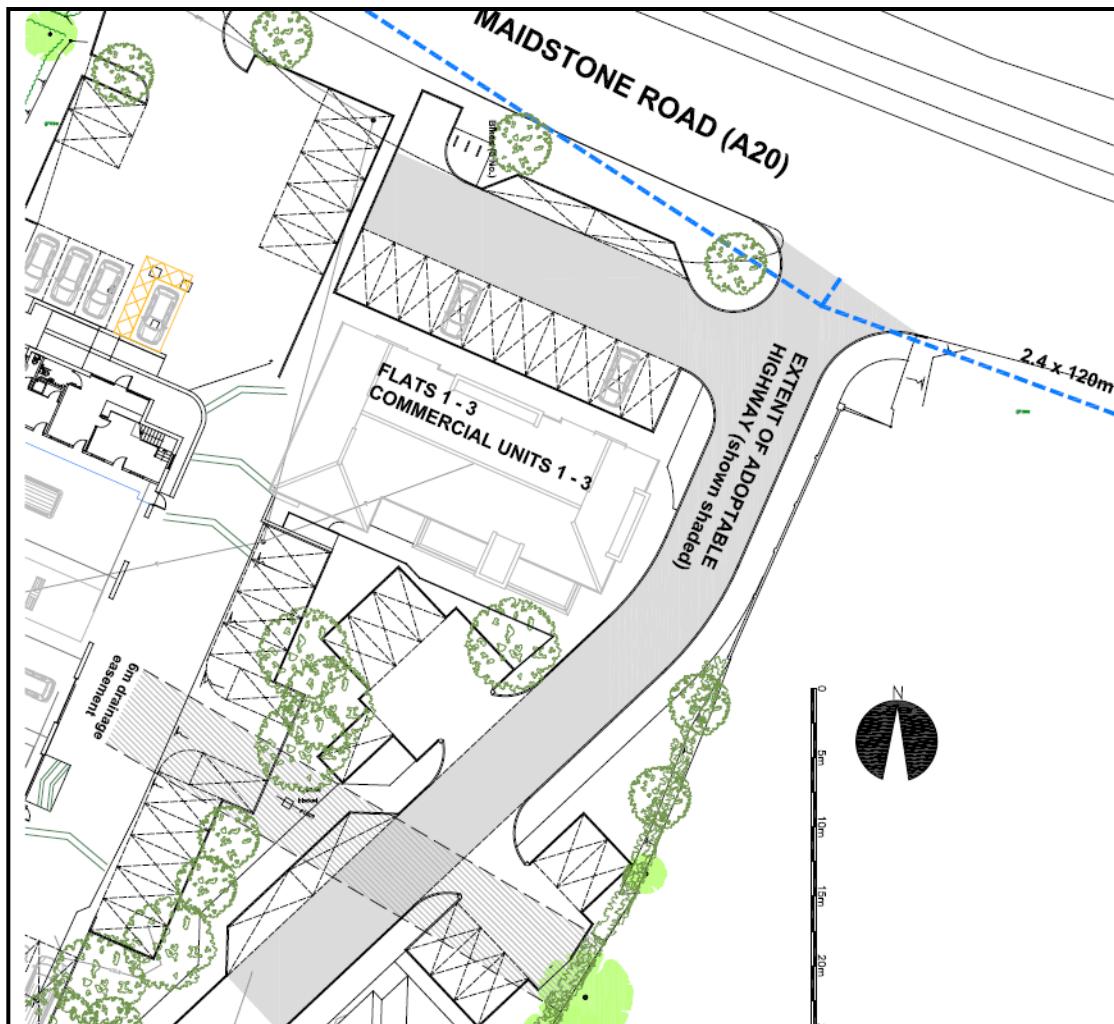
Plan to show sightlines and area for potential adoption by KCC
